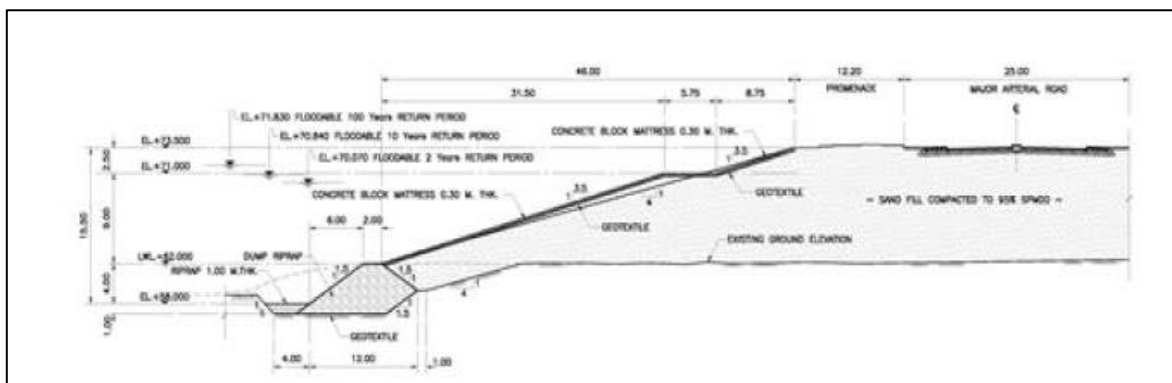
section of Waterfront (dump rip ap + concrete block matters) Alternative 2
